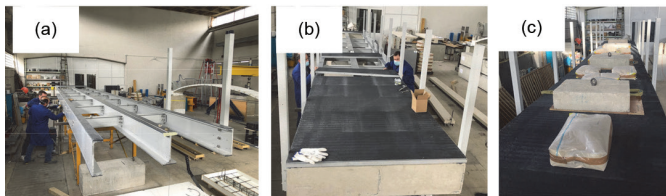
Ultra - lightweight FRP laboratory footbridge a) assembling of super-structure b) bridge walking surface c) ambient vibration test
